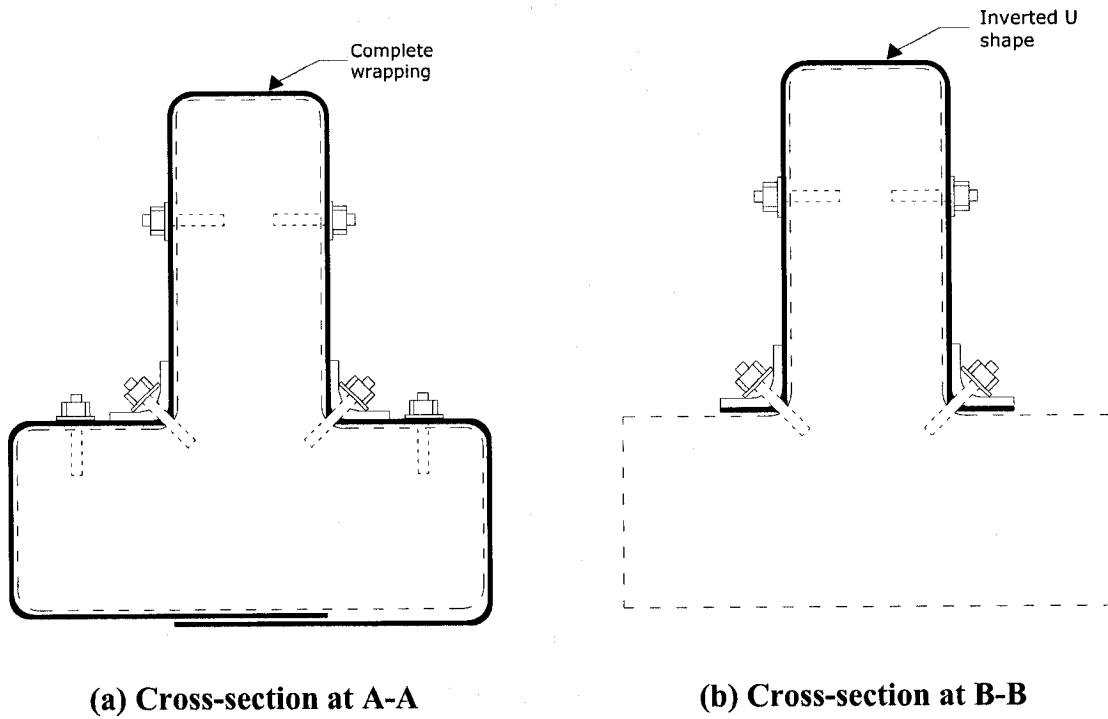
Anchoring techniques used in girder IT-G2R at (a) Cross-section A-A, and (b) Cross-section B-B
